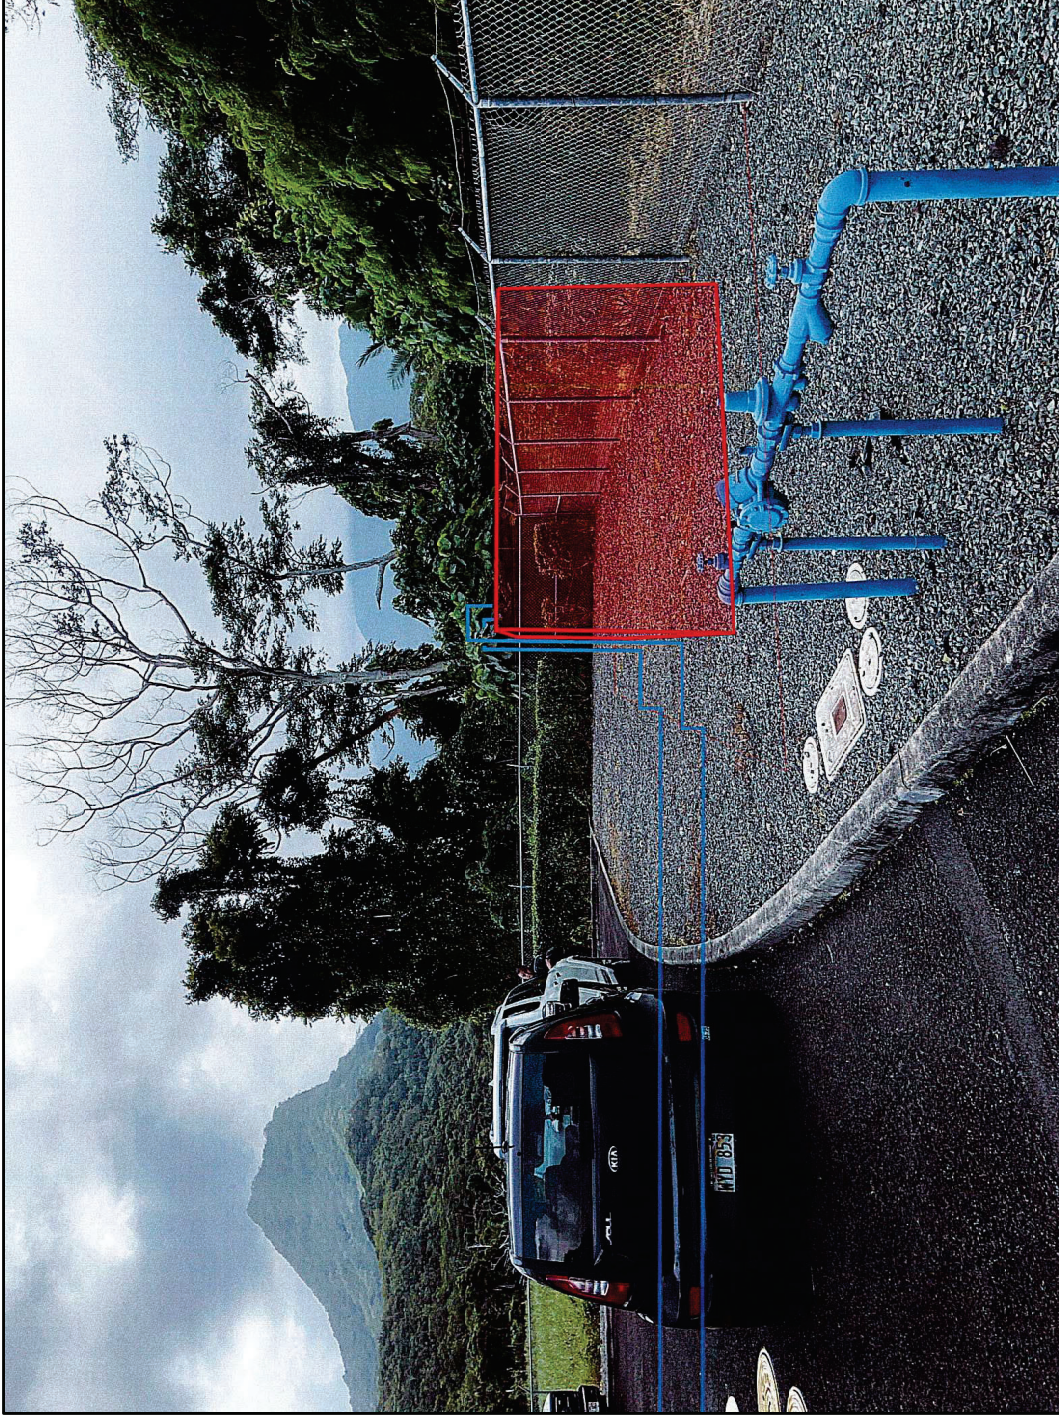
Photograph showing the location of the new 1,000-gallon AST on the central west side of the Maunawili Park Wastewater Pump Station facility and adjacent new underground fuel piping, view to south (Okahara and Associates, Inc.; courtesy of client)
